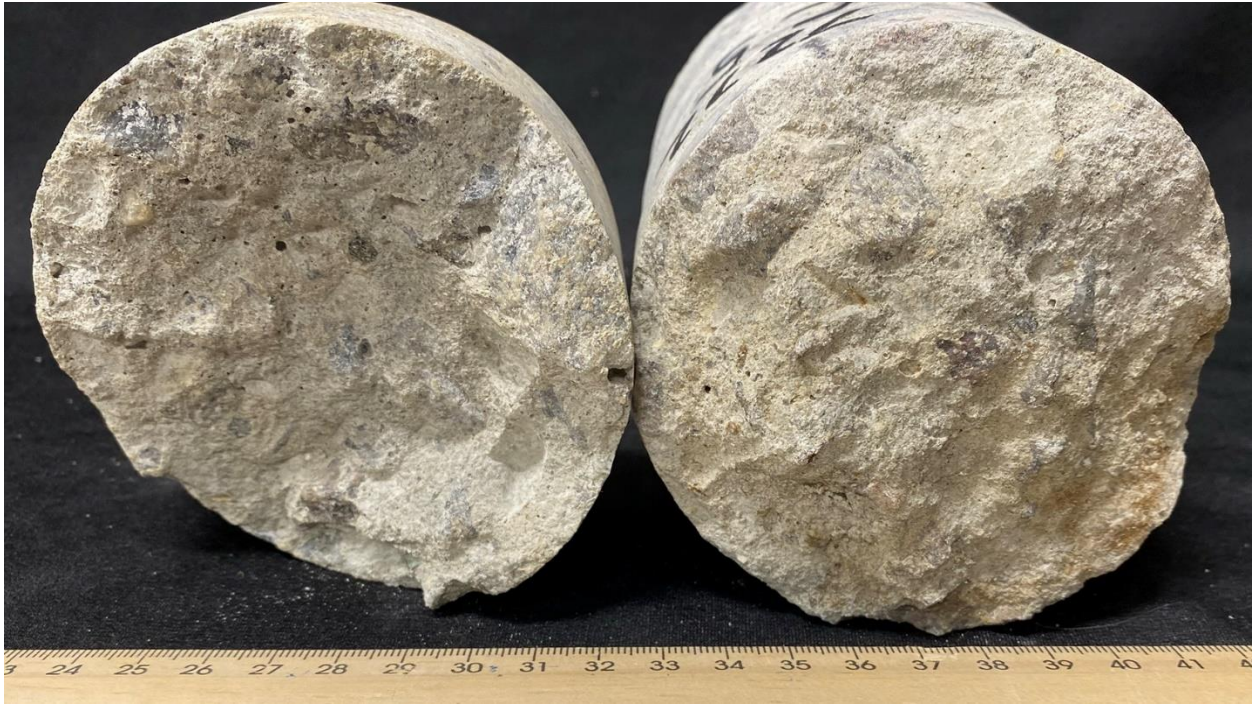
7272-C5. Opposing fracture faces within the core. There are no impressions of rebar along the fracture. The fracture propagates around and through coarse aggregate.
